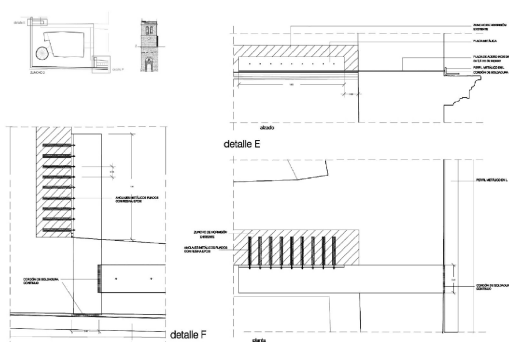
Constructive detail for the brace at level 2 (lower cornice).
